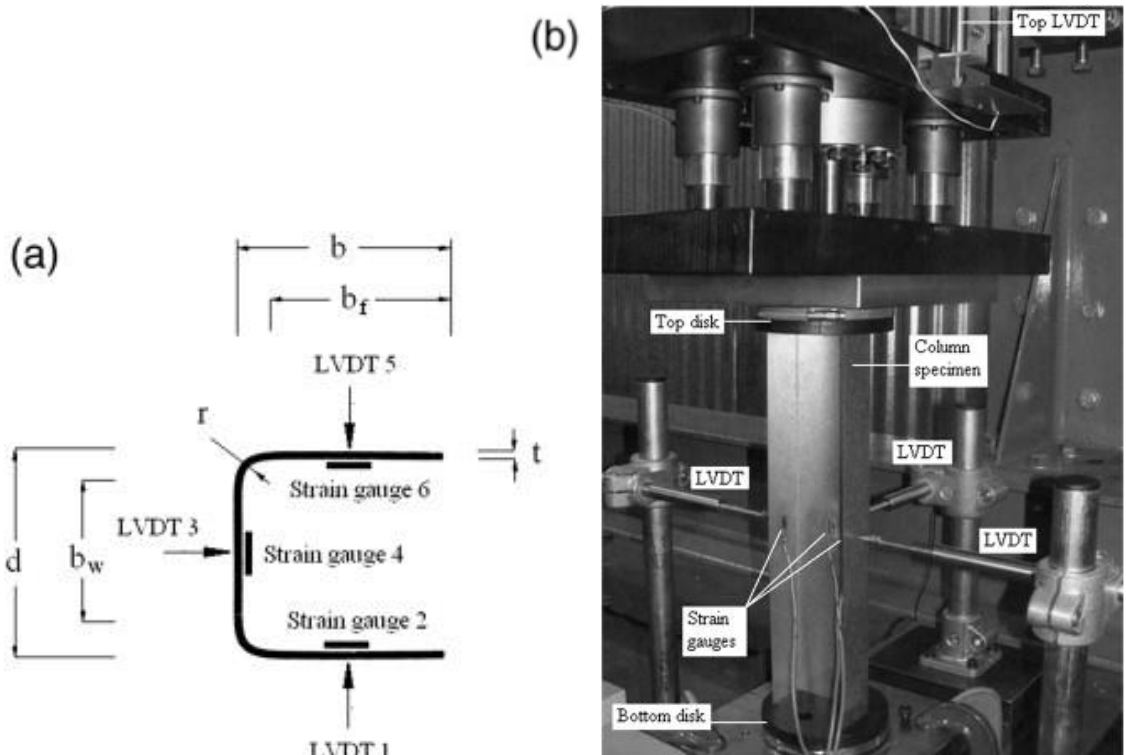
(a) Cross-sections and geometries of column specimens and (b) overall view of testing setup Nguyen et al. [67]
